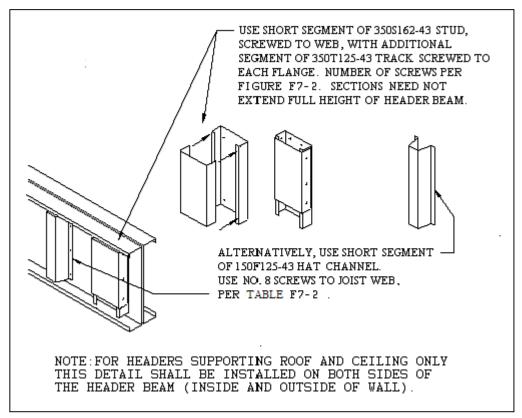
Back-to-Back Header Beam Reinforcement for Uplift Strap Connection
